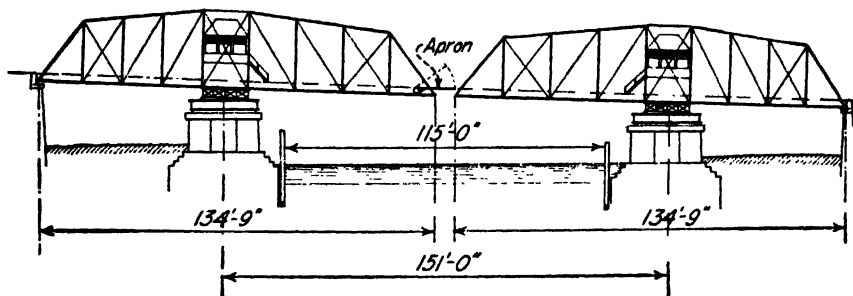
Double, Rotating, Cantilever Draw Bridge over the Cuyahoga River at Cleveland, Ohio.
